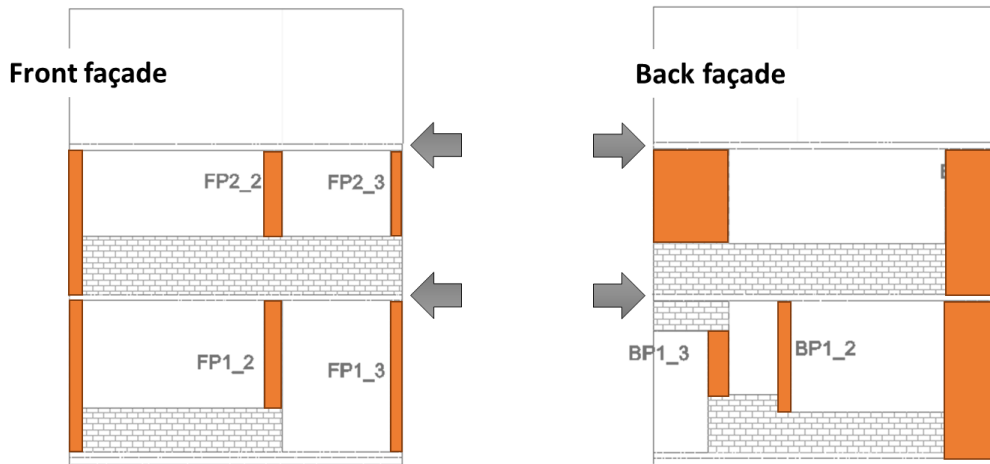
Piers defined on the front and back façades of Building C for negative loading.
